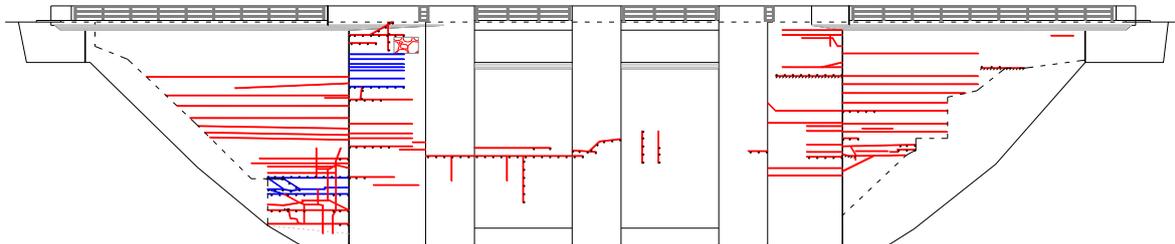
Fagilde dam. Cracking pattern of the downstream face in 2009 [29]
